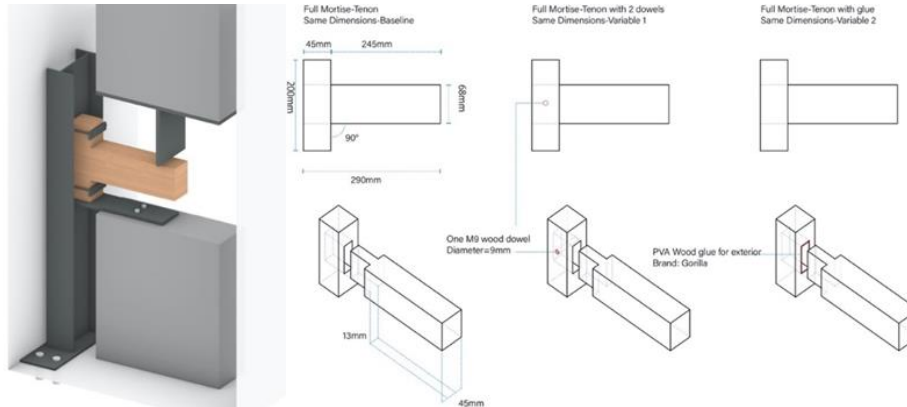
(a). The metal clamp used to support specimens; (b). Dimensional drawings of the three variables
